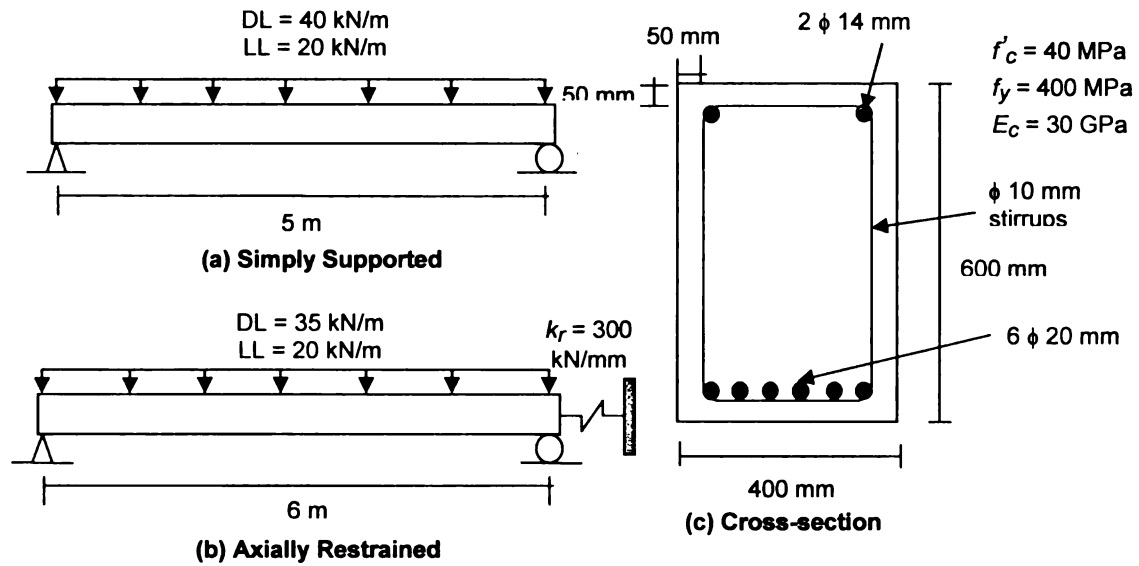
Cross-section and Elevation of RC Beam used in the Worked Example
